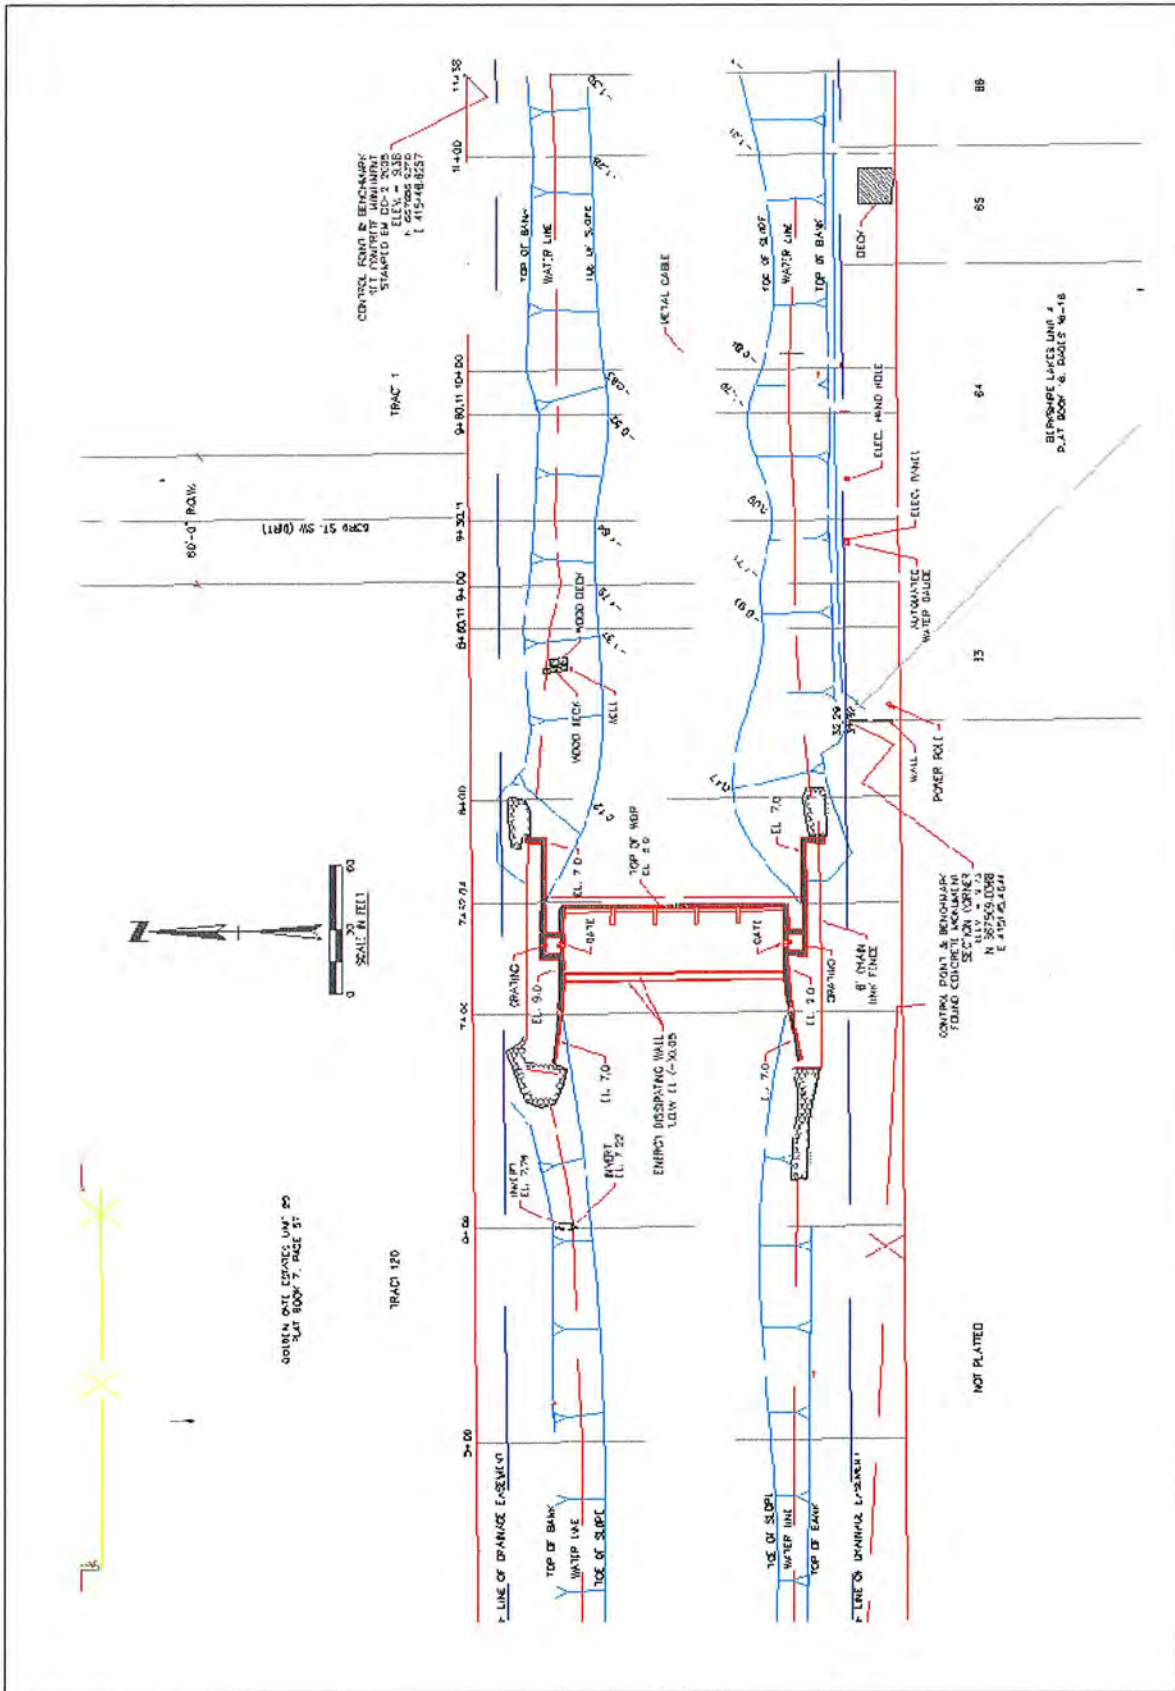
Existing GG-2 Structure Site Plan (Elevation in ft NGVD)
